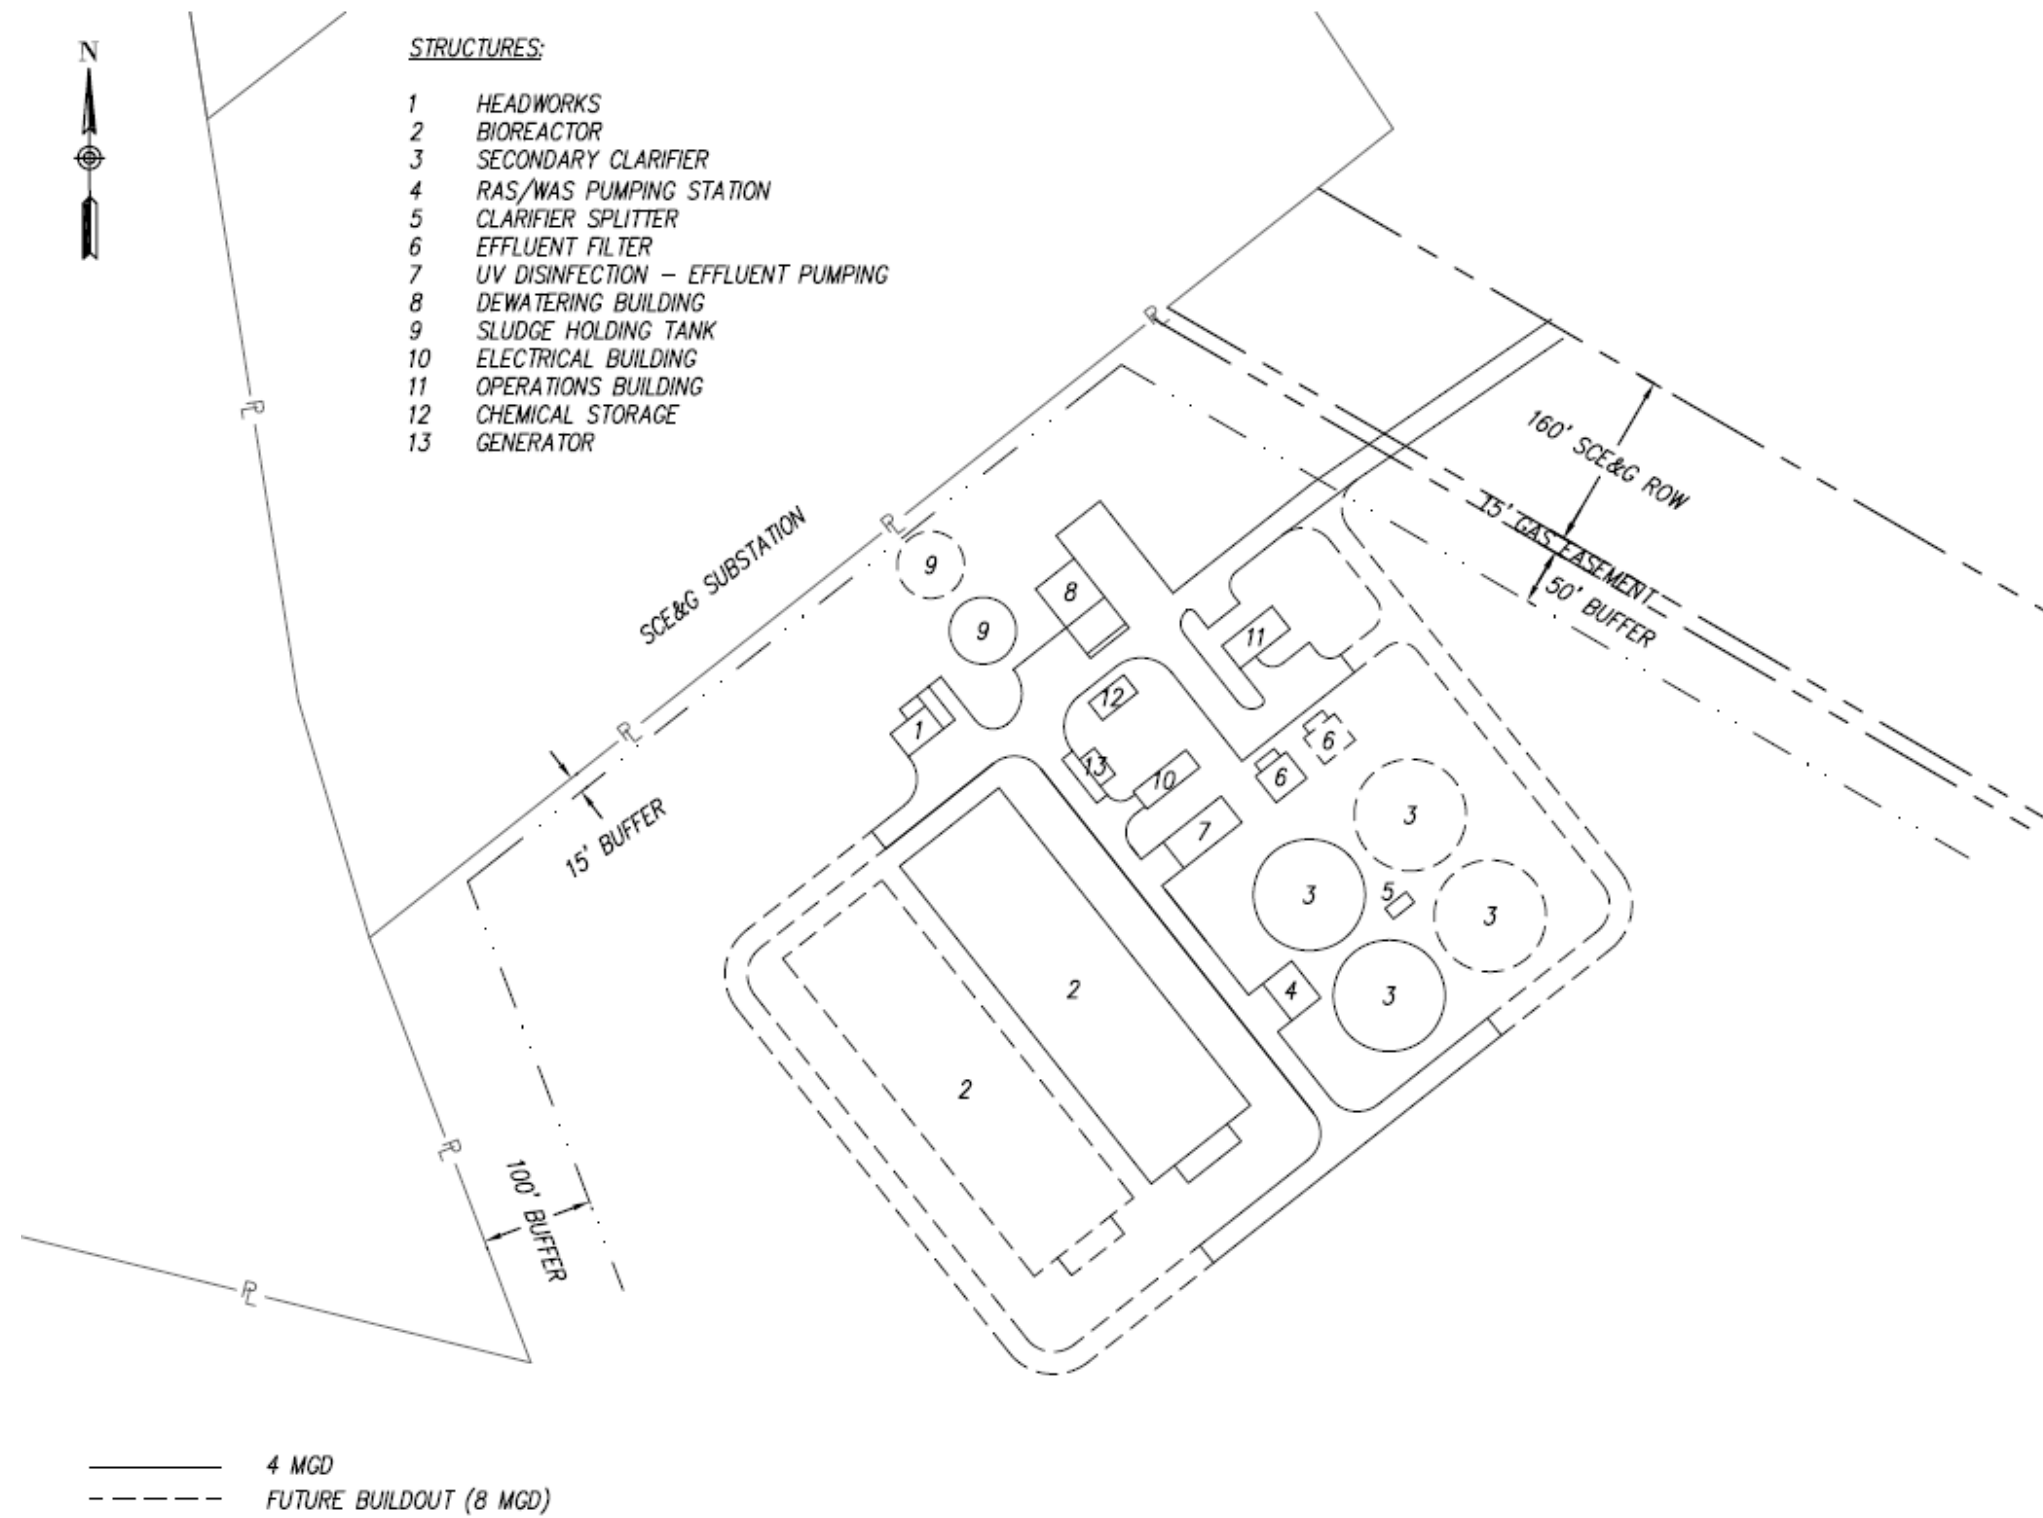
Central Dorchester WRF Conceptual Site Plan
